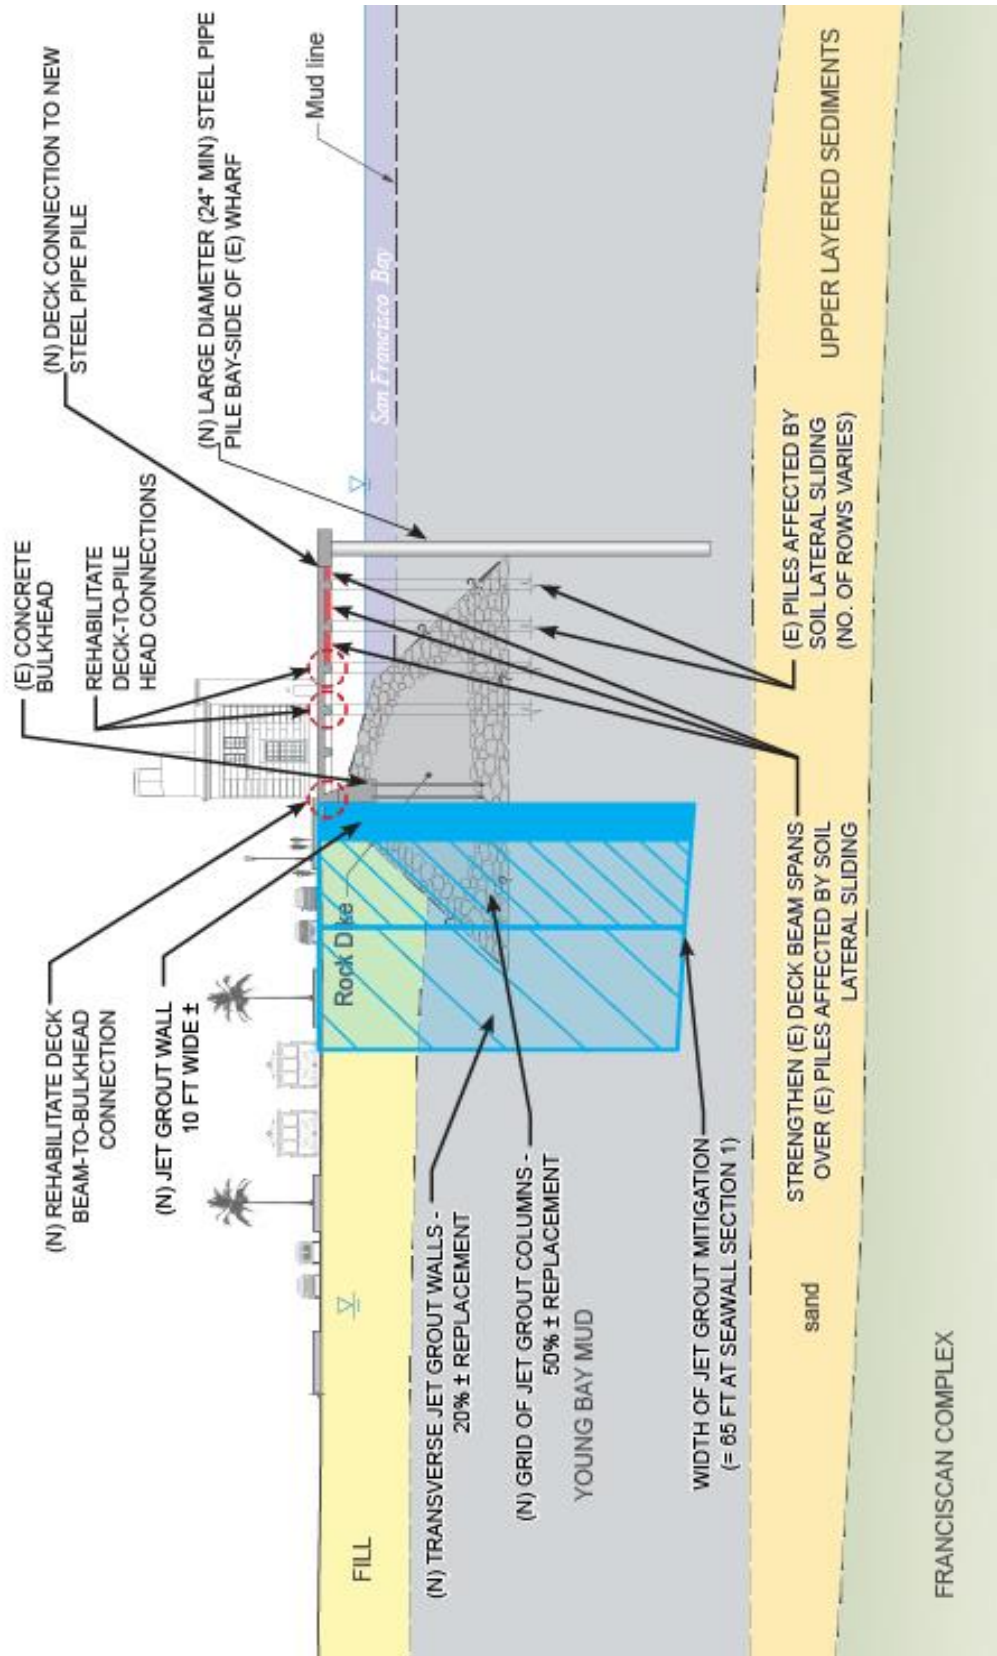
Typical Section Combined Mitigation Alternative (S-14) – Jet Grouting & Deep Soil Mixing and Bulkhead Wall & Wharf
